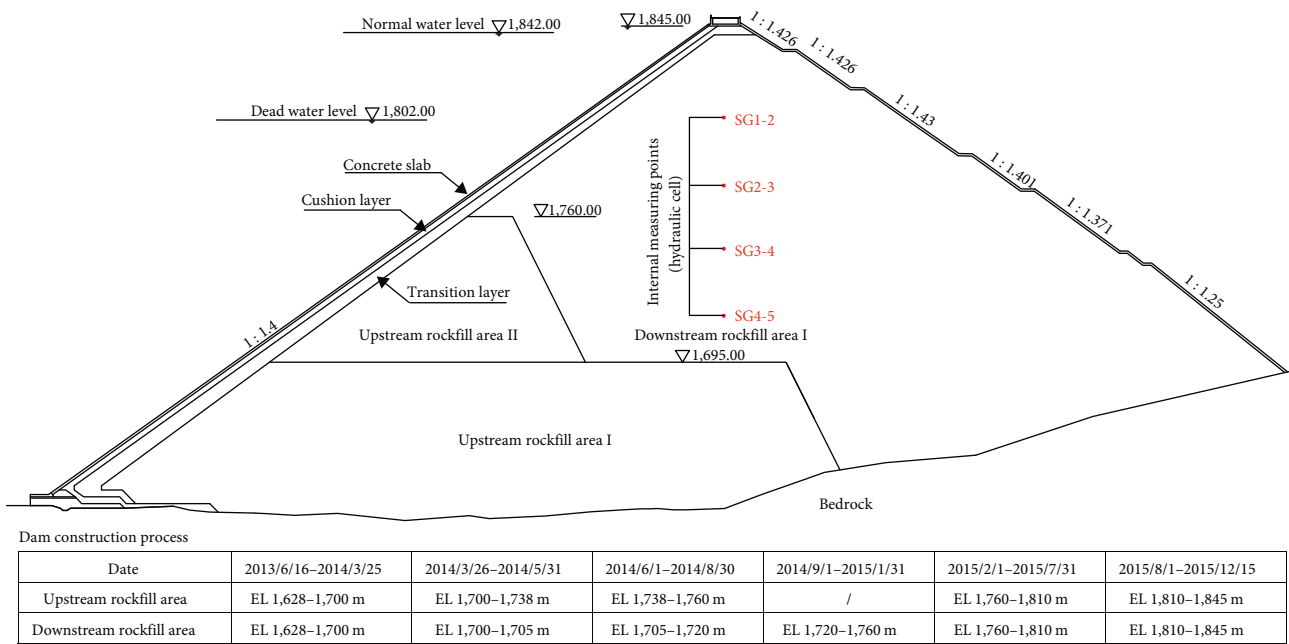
Typical cross-section and the construction process of the Houziyan dam.
